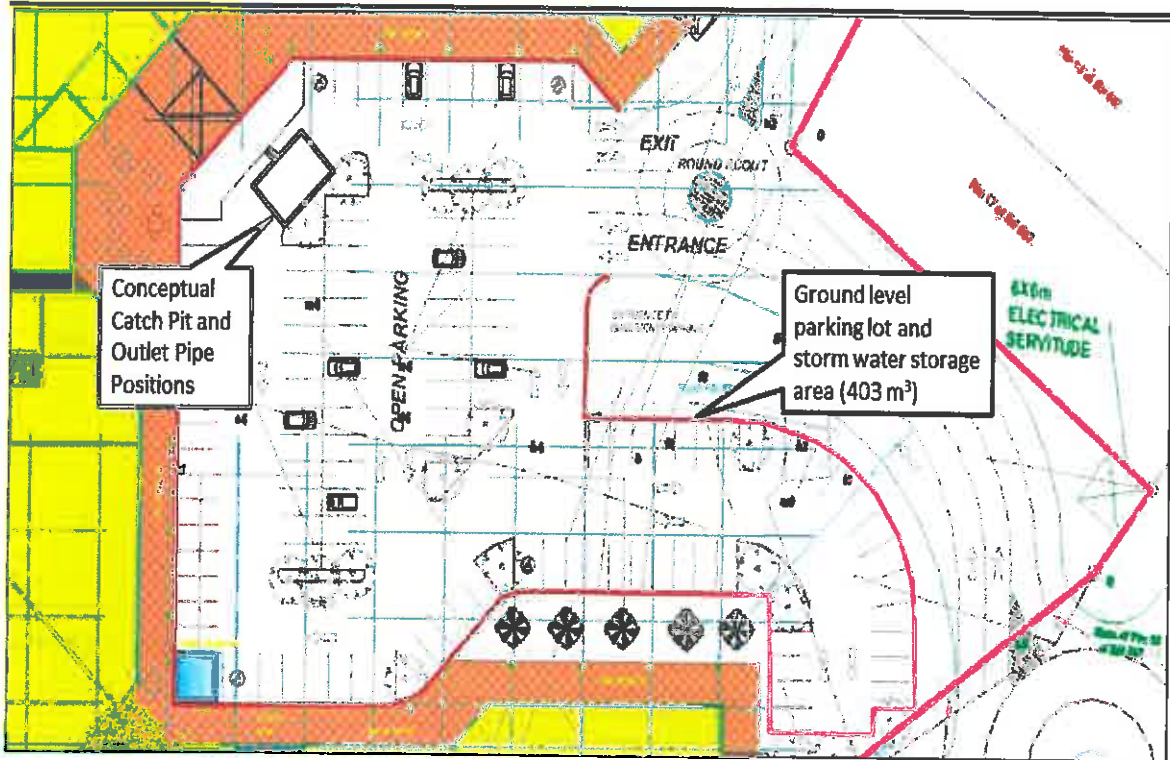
Conceptual Plan View of the Ground Level SWMP infrastructure
